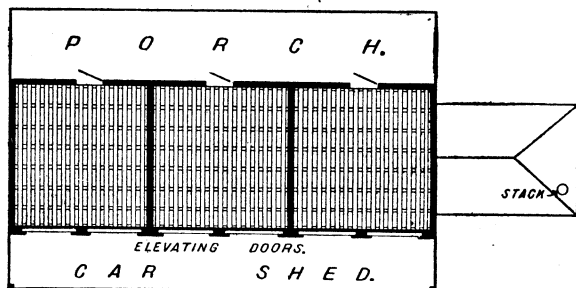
Plan of second or drying floor of air-blast kiln.
